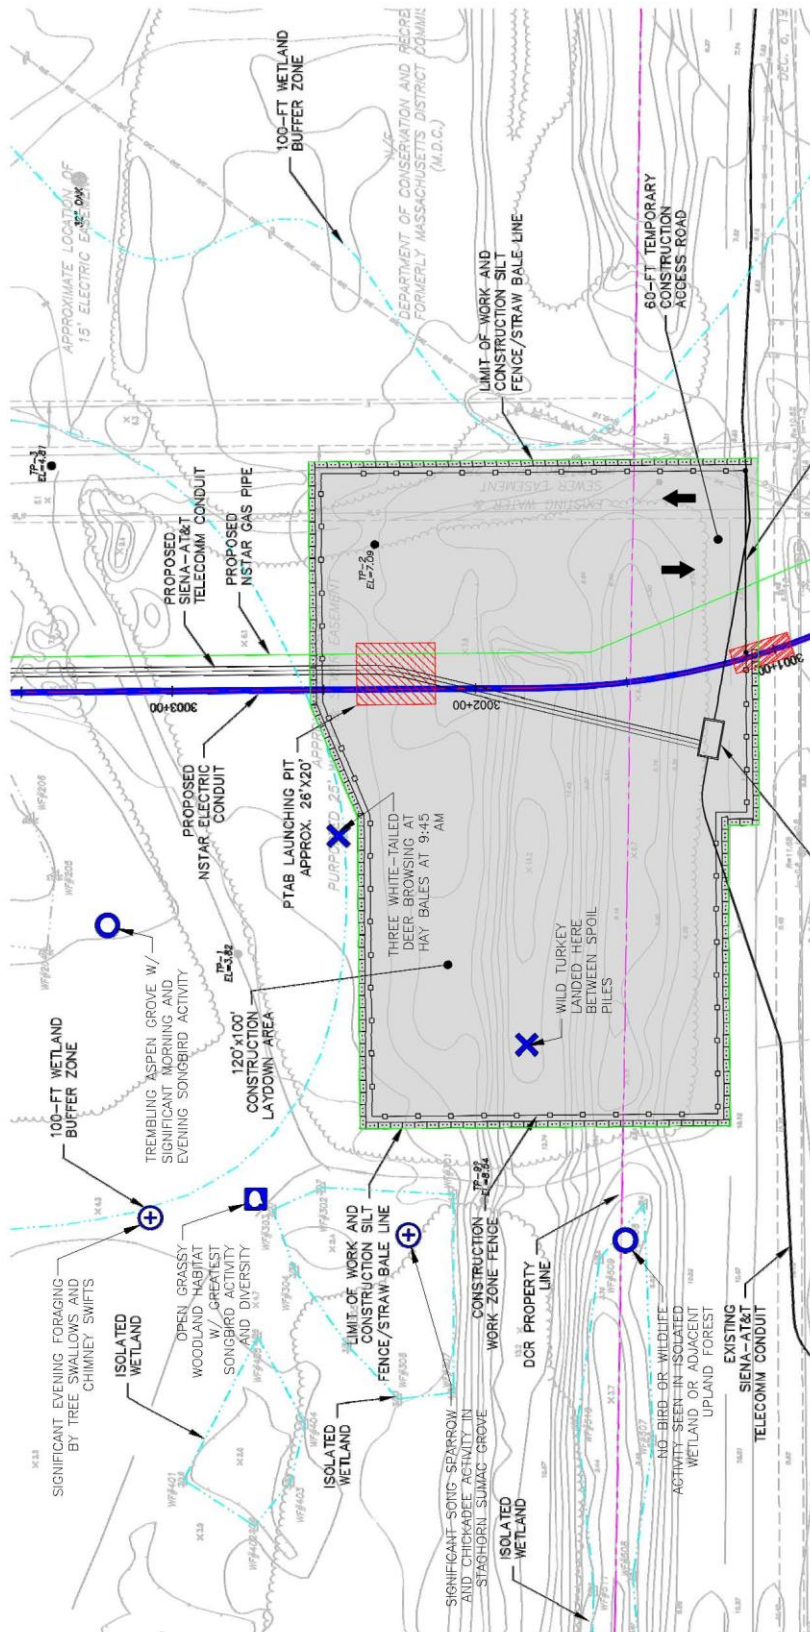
Excerpt of PTAB Launching Pit Site Plan with Locations of Habitat and Wildlife Observations
